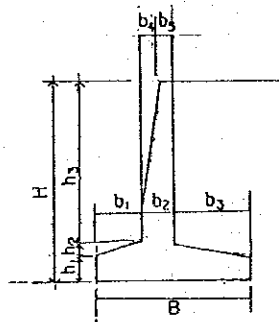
CANTILEVER TYPE RETAINING WALL
